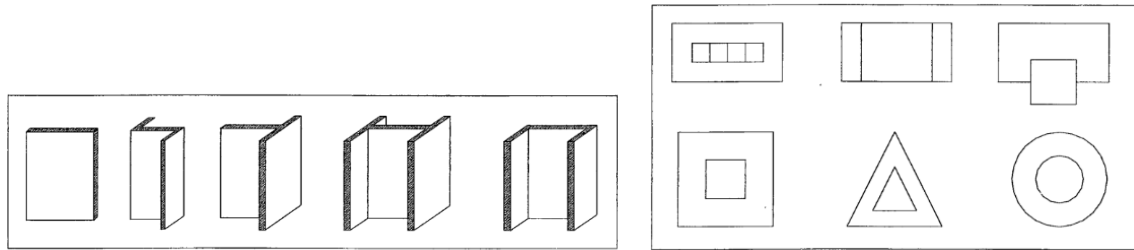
Open shear wall systems (left), Closed shear wall systems (right)
